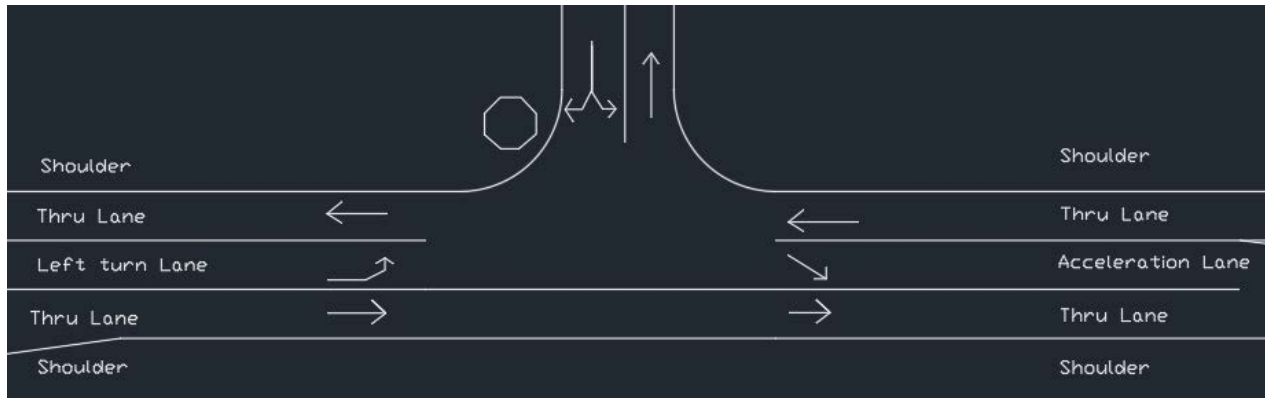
Conceptual Layout of Caltrans' Proposed Restriping Project (not to scale)
